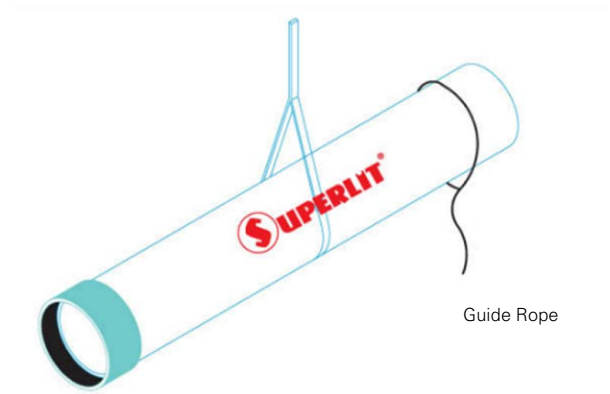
Lifting GRP pipe with a nylon sling and guide rope
